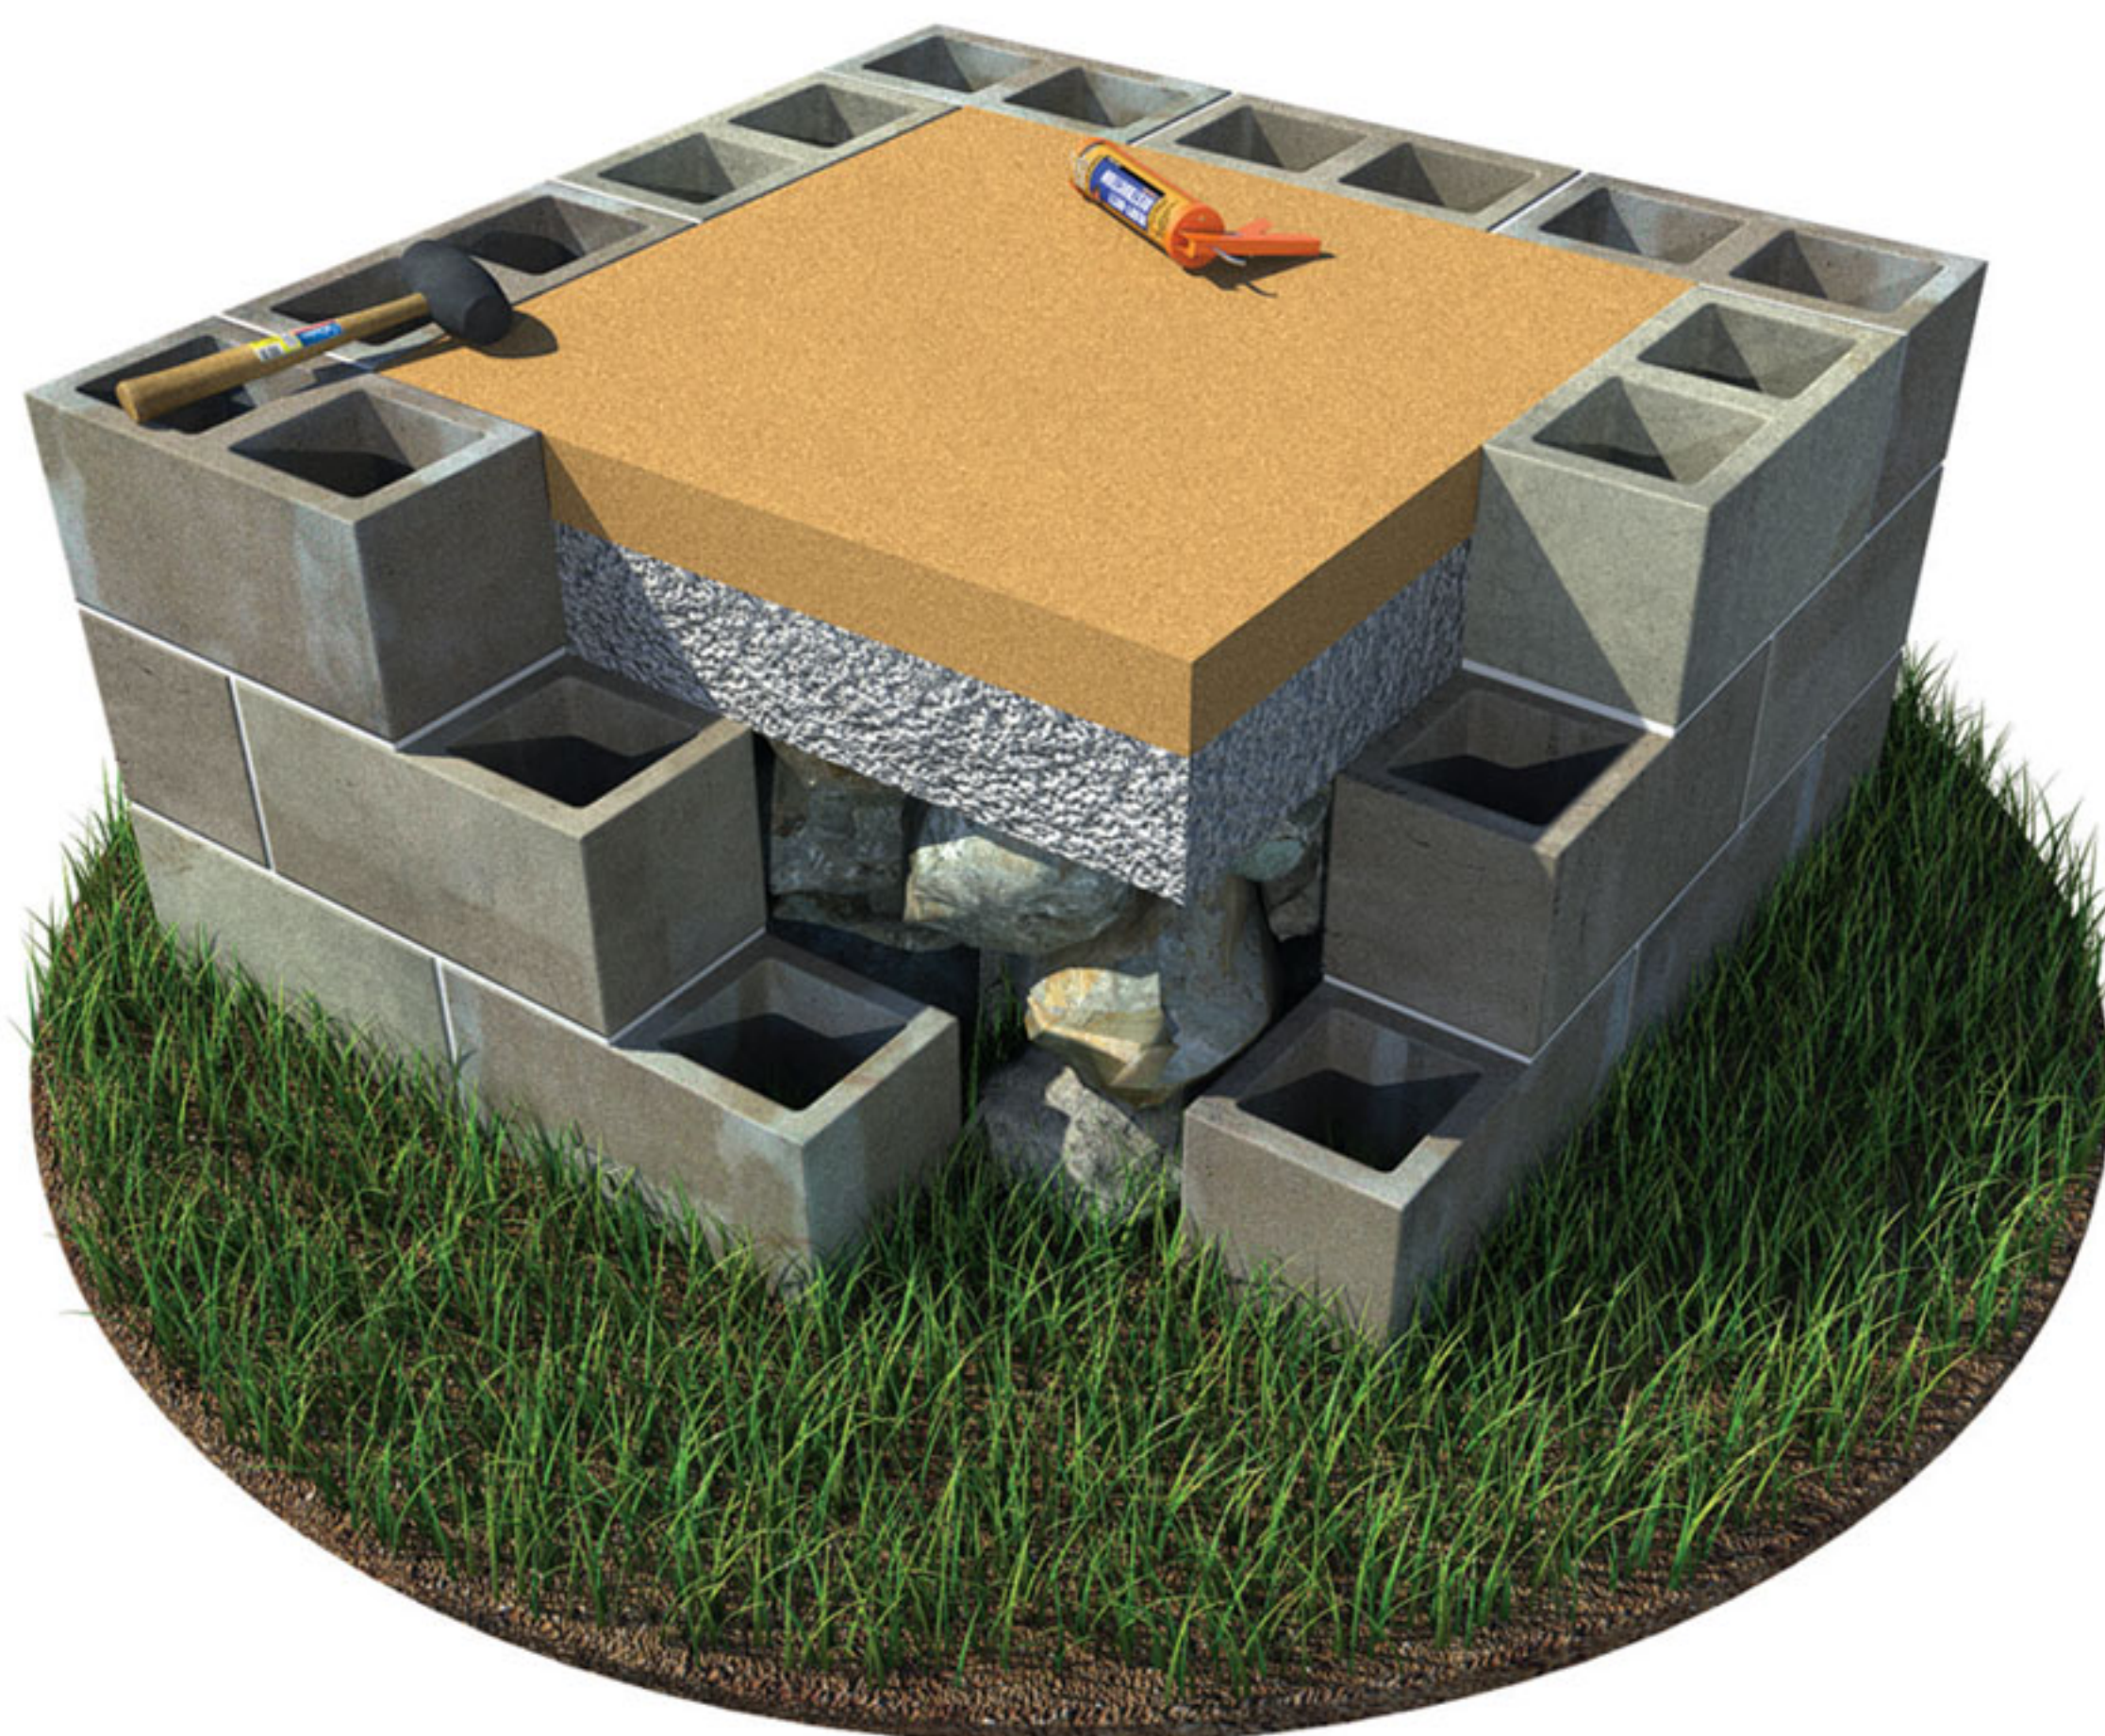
Preparing the base: Concrete block walls are filled with rubble topped with layers of a gravel/sand mixture, vermiculite and sand.
